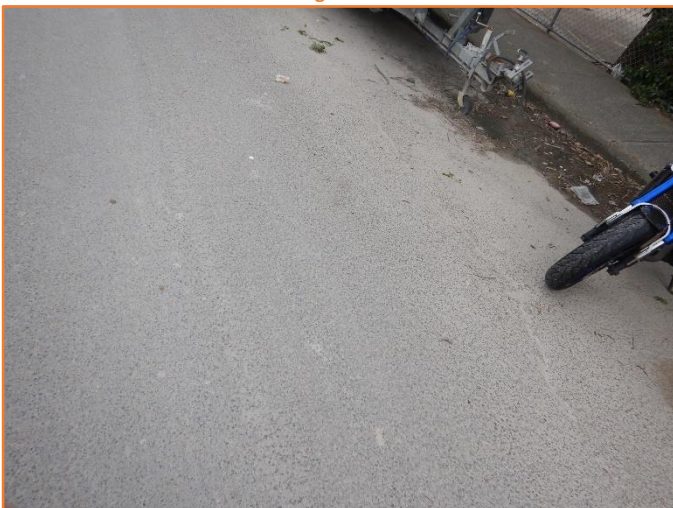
Reasonable - General condition of flexible pavement. Minor cracking observed.
